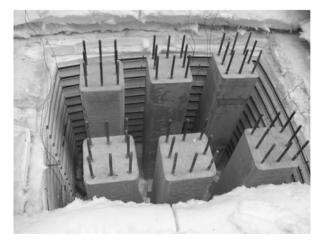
ARRANGEMENT OF POST-HEATED SQUARE REINFORCED CONCRETE COLUMNS IN FURNACE
